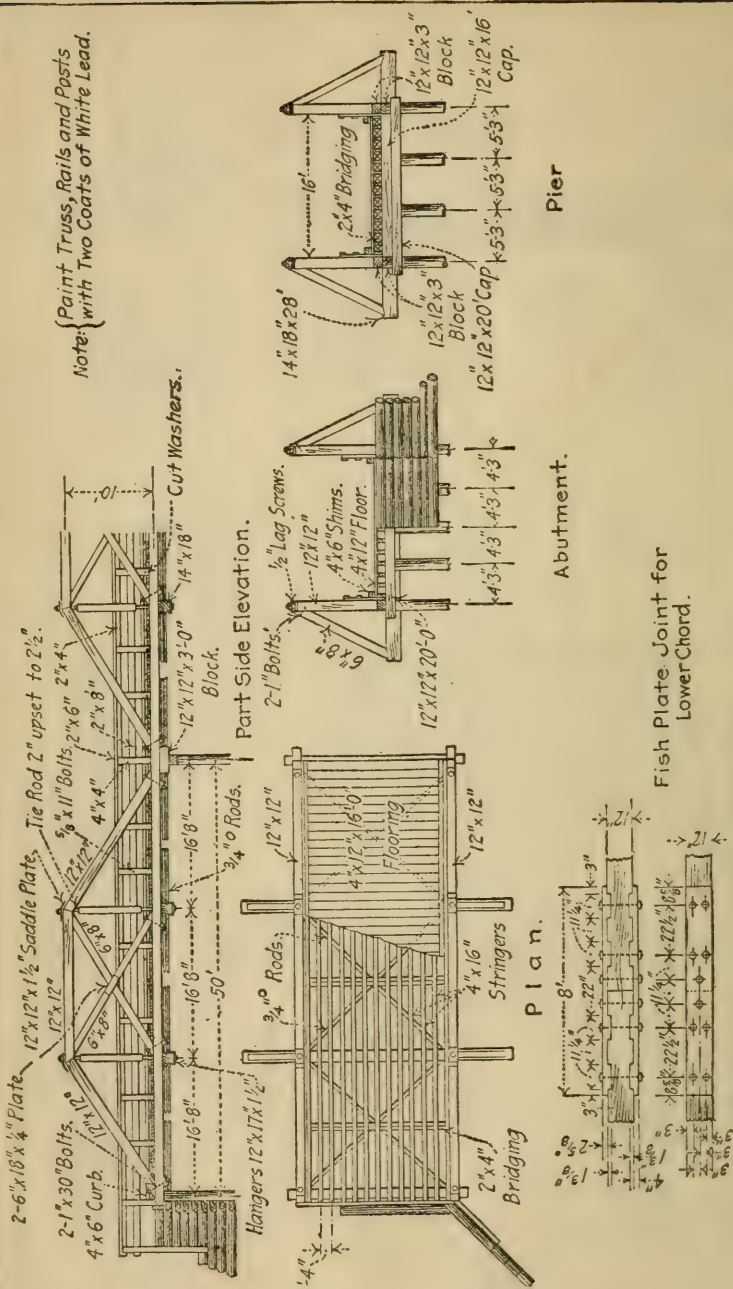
Typical 50' span pony truss timber bridge. State of Wyoming.
